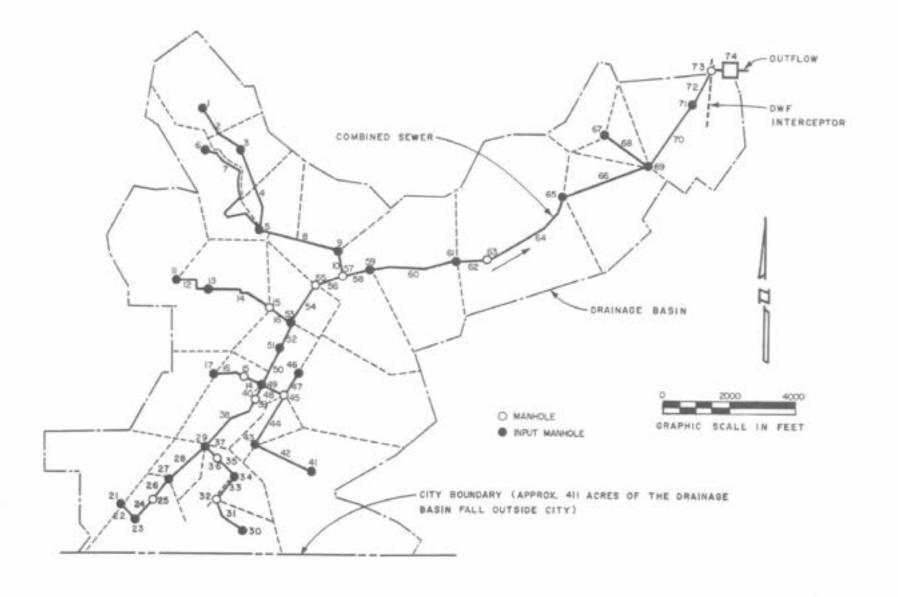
PLAN OF SELBY STREET SYSTEM
